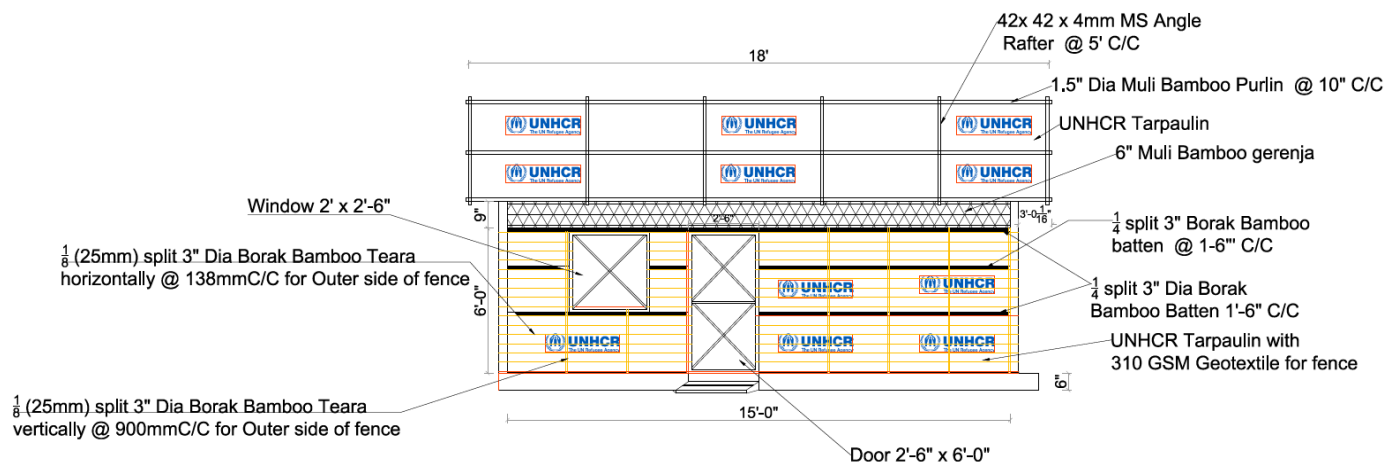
Front side elevation of geotextile with tarpaulin, wire mesh and cement grouting.
